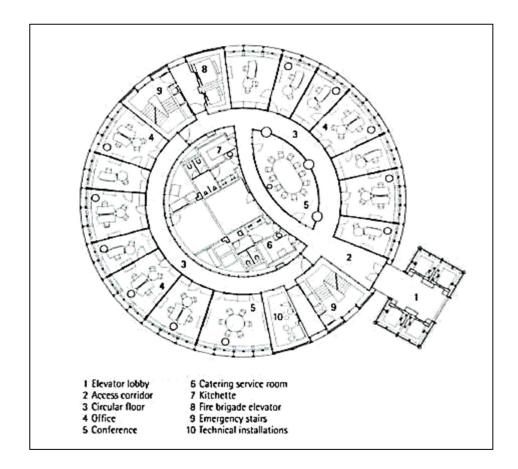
RWE Headquarters Tower – typical floor plan (courtesy of Ingenhoven Architects)
